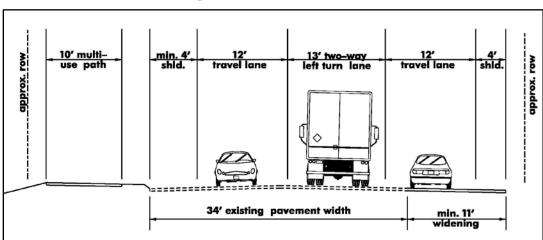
Proposed VT 2A Cross-section Just South of River Cove Road
